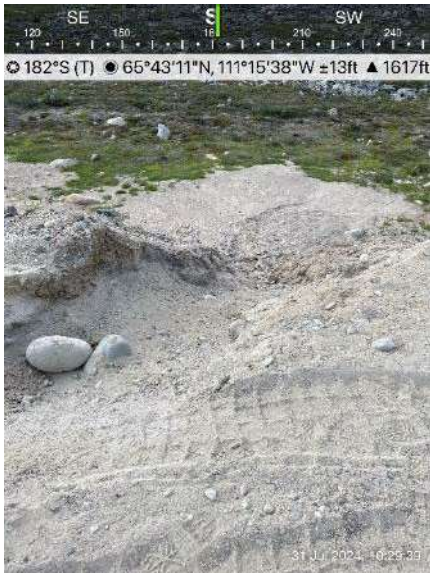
Overview of an existing erosional feature on the downstream embankment at Dam 4.
